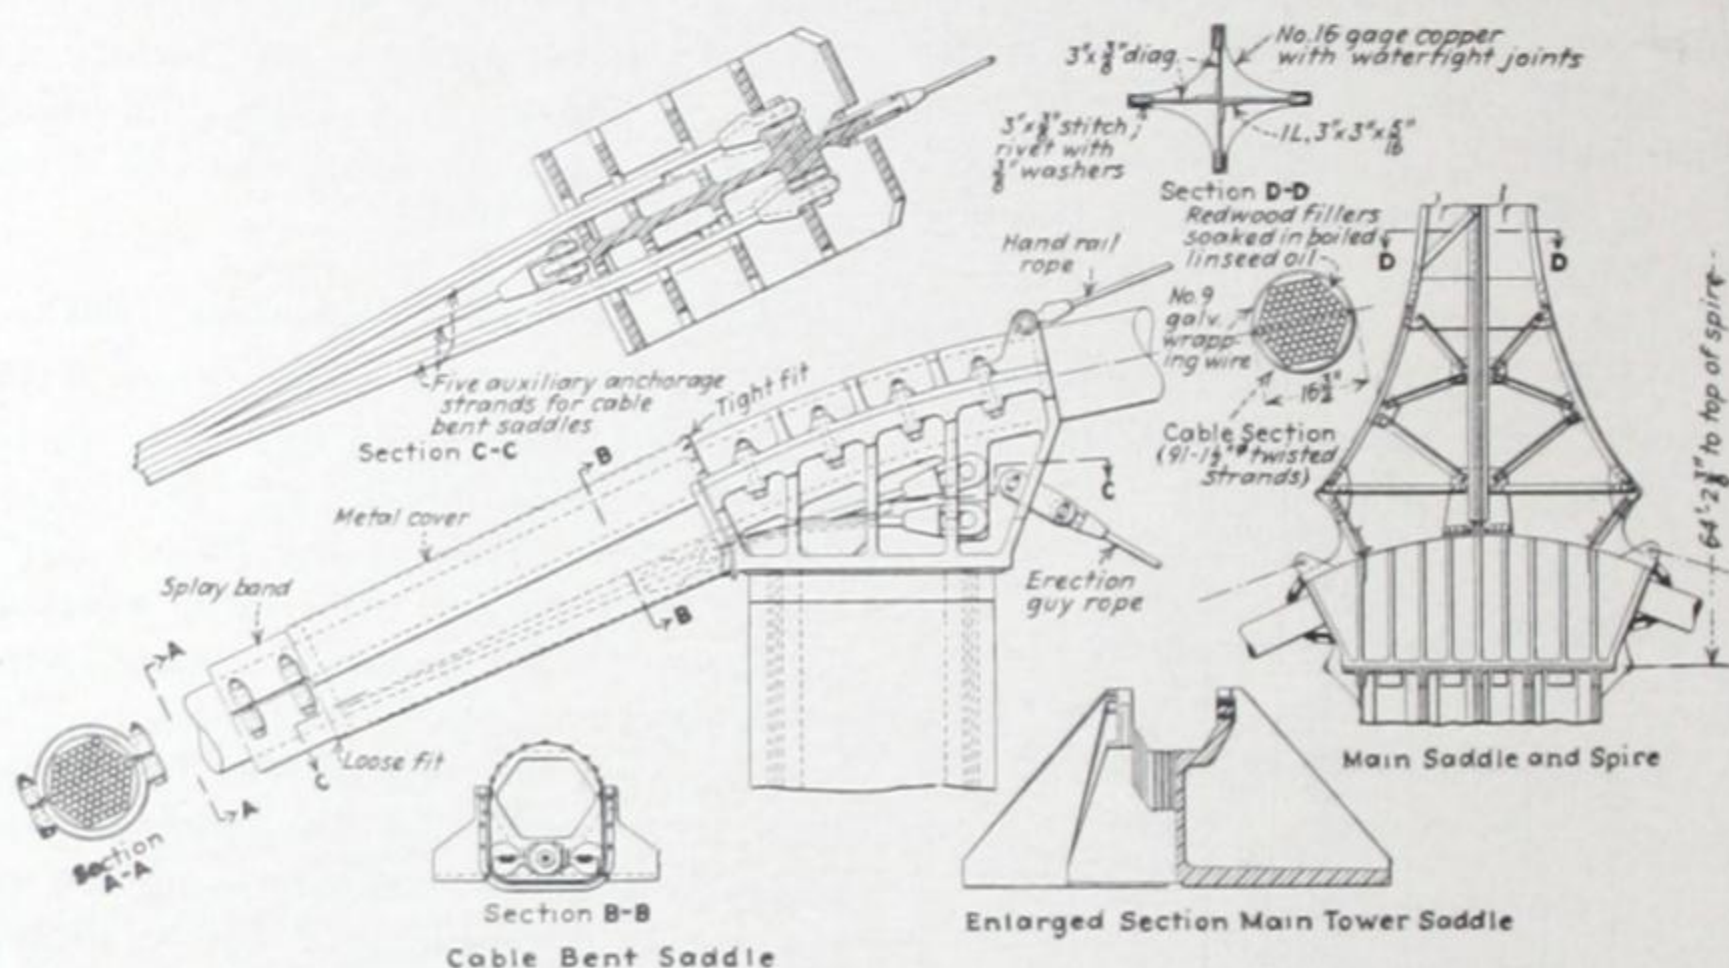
Saddle Details for Rope-Strand Cable Suspension Bridge
